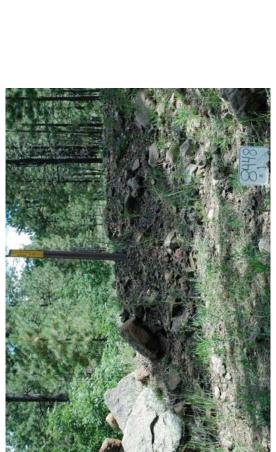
Road closure functioning, recommend WSA boundary at barrier, but TMP PA proposes to open route to dispersed campsite on 8948A. Resolve (GPS 675070, 3761890)
